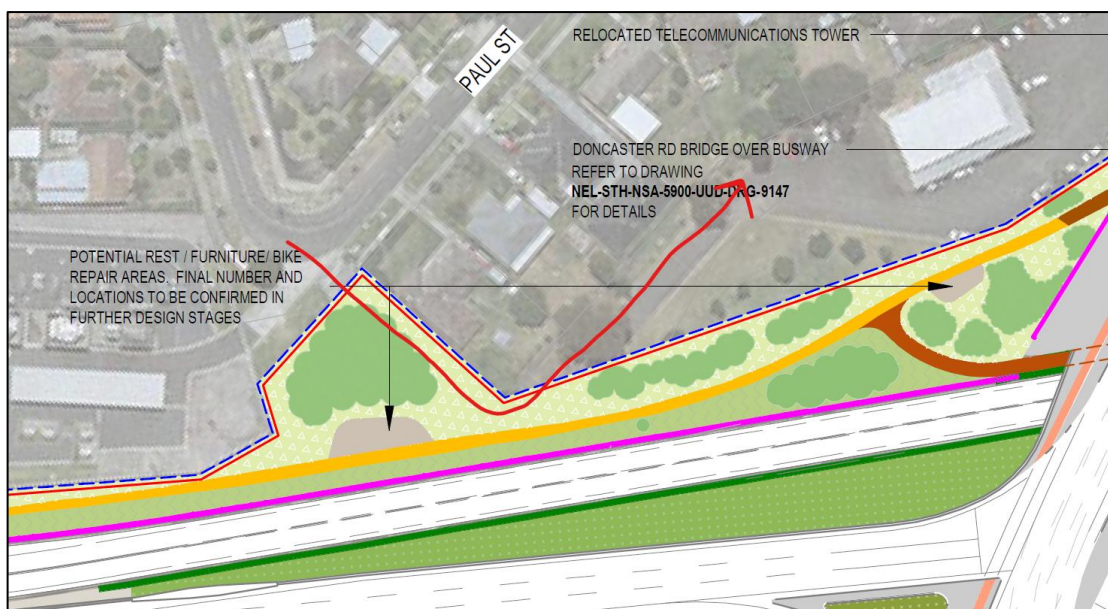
excerpt of UDLP Landscape Plan for Zone 7 showing the current access to the Scout Hall via a red arrow.
